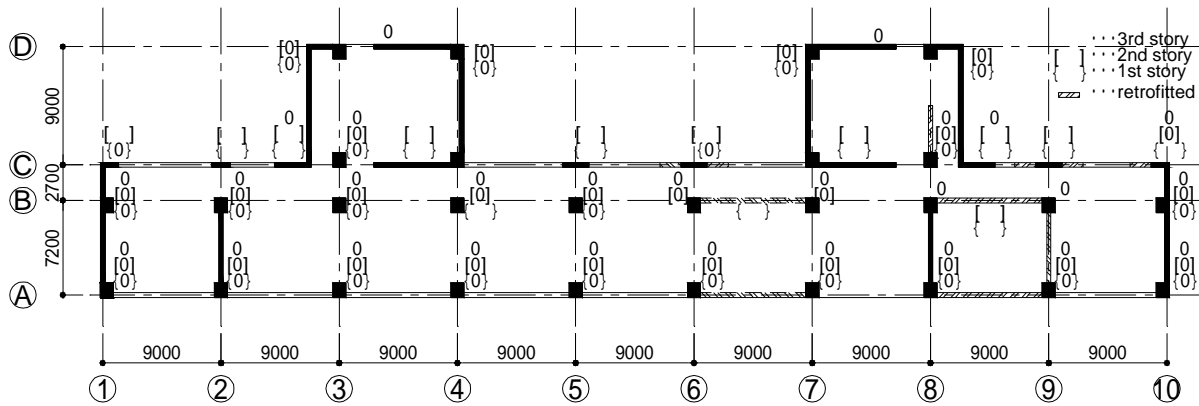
Damage level of column and wall members (TS-1 building of TS-High school)
